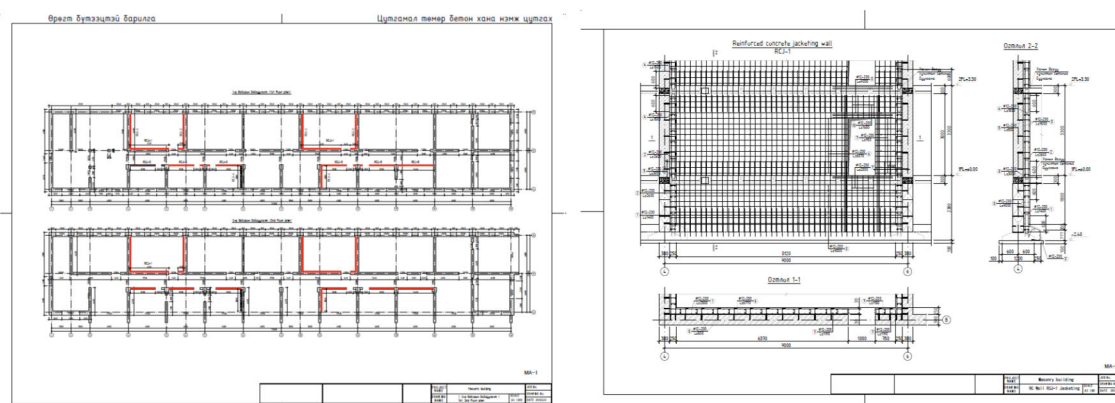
Example of Strengthening the masonry building by Additional RC Walls
